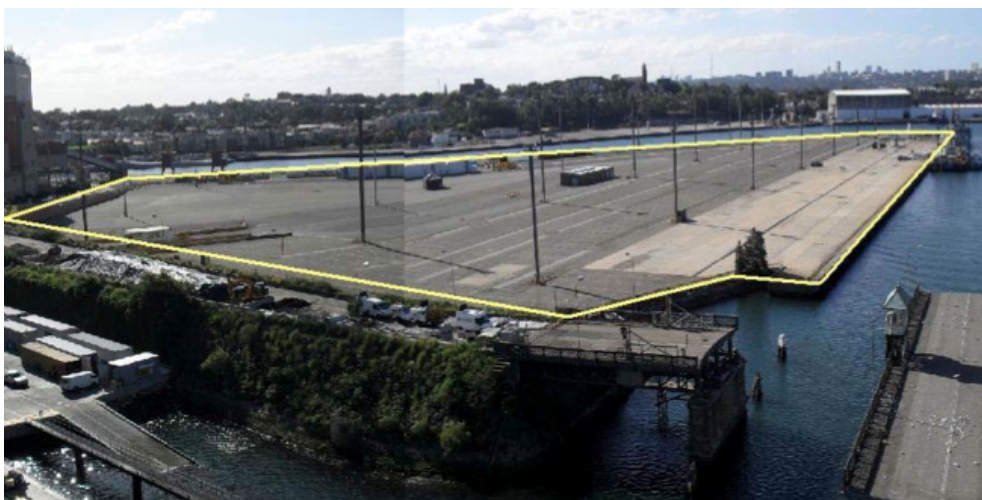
Montage of subject site, with boundary depicted in yellow, as viewed from ANZAC Bridge
